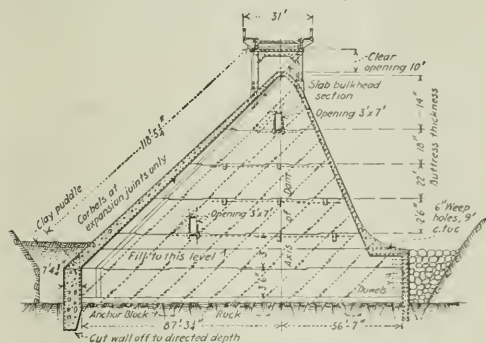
SPILLWAY SECTION OF CISCO DAM
